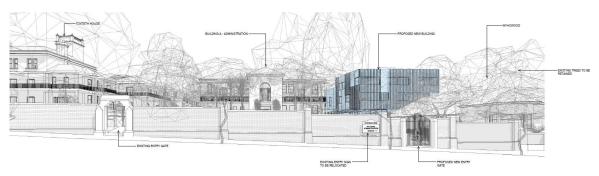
Proposed Avenue Road Streetscape (DJRD Architects)
